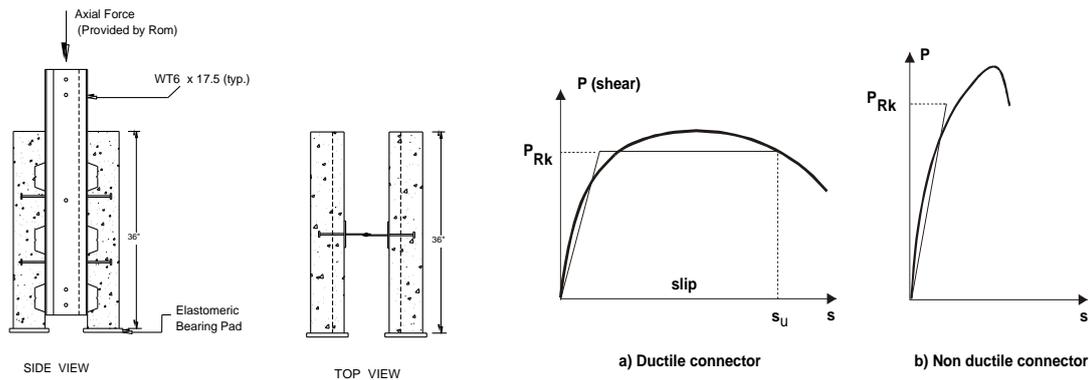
Typical details of push-off specimen Figure 2: Standard connection behavior
